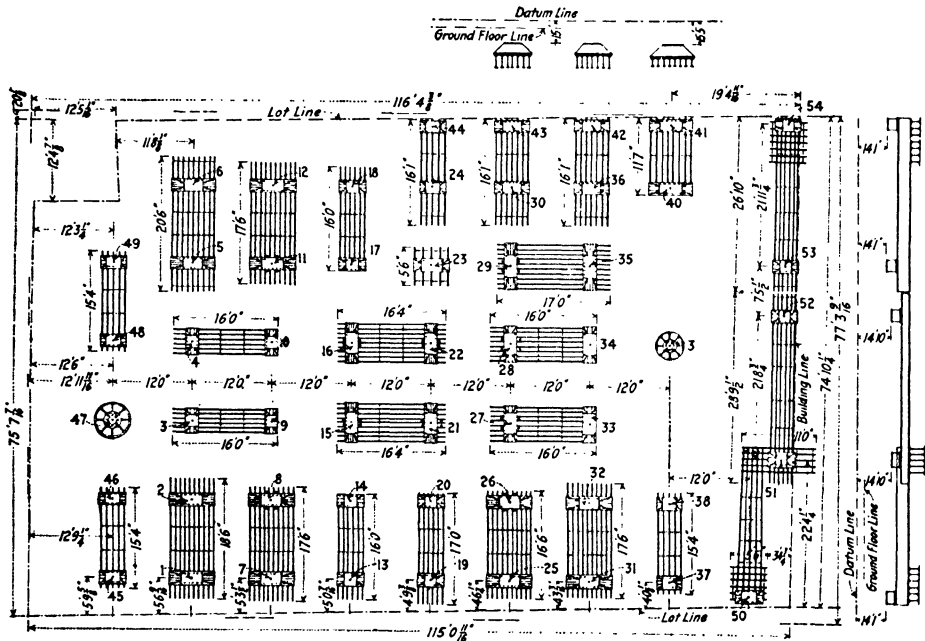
FOUNDATION PLAN OF SINGER BUILDING.
